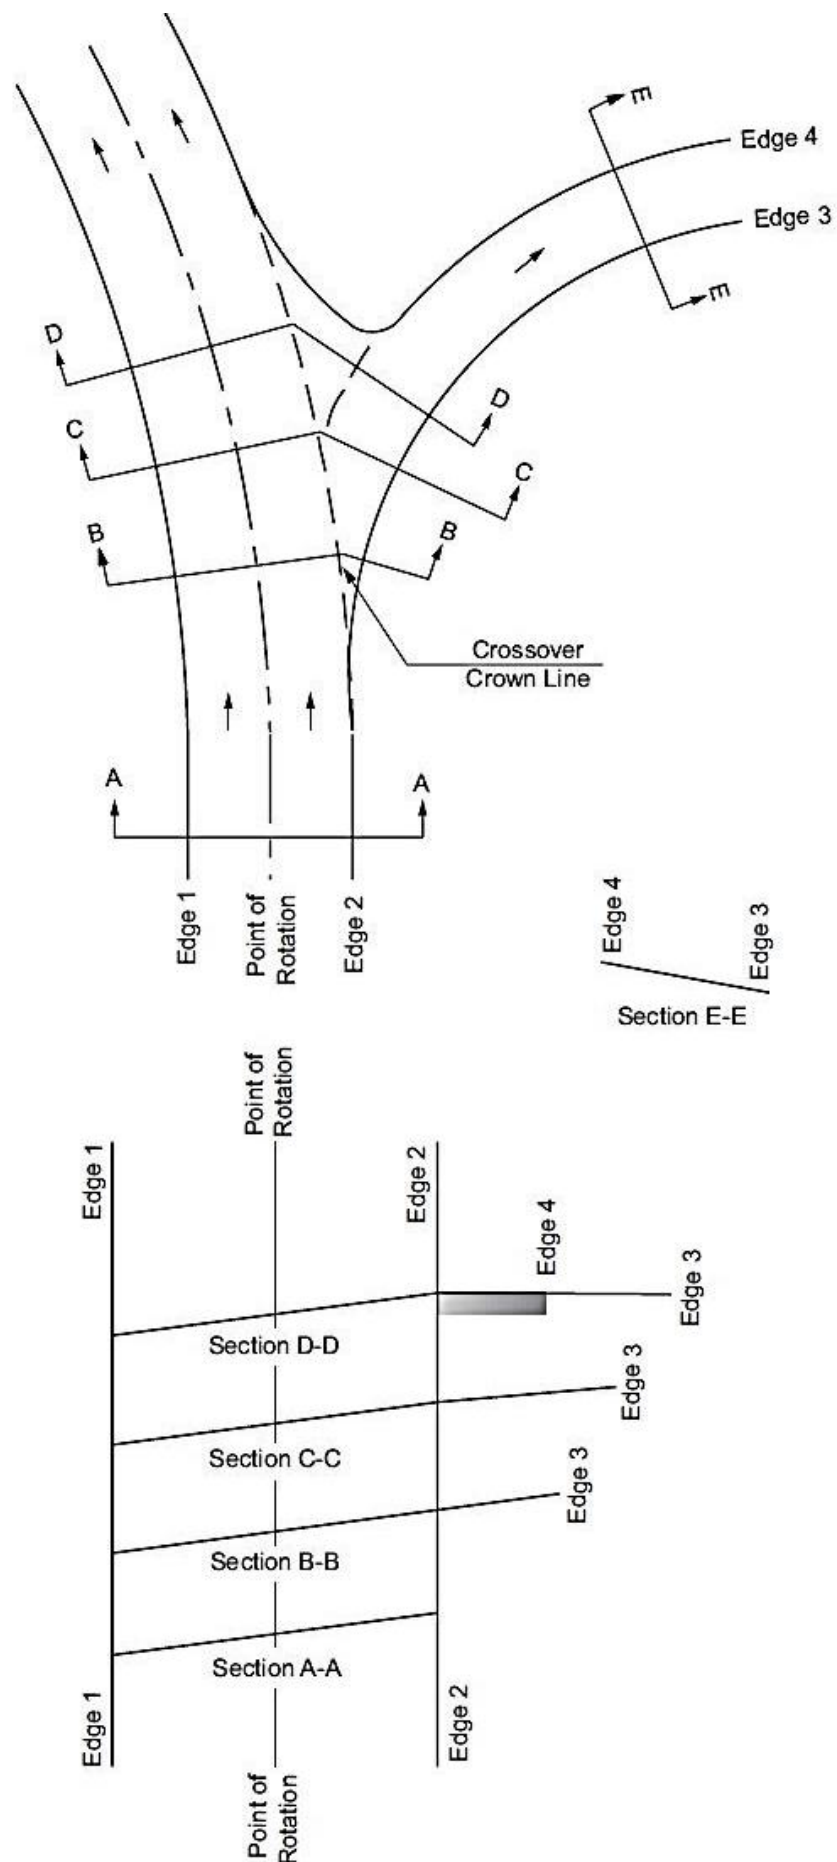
/3: Development of Superelevation at Turning Roadway Terminals [4, p. 650]
